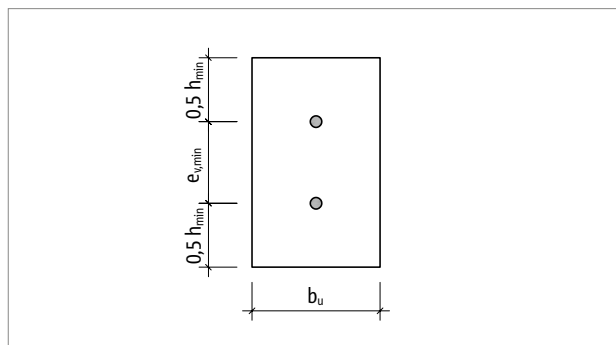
Schöck Stacon® type LD: Minimum structural component measurements and dowel spacings in the front face of a balcony or a wall
